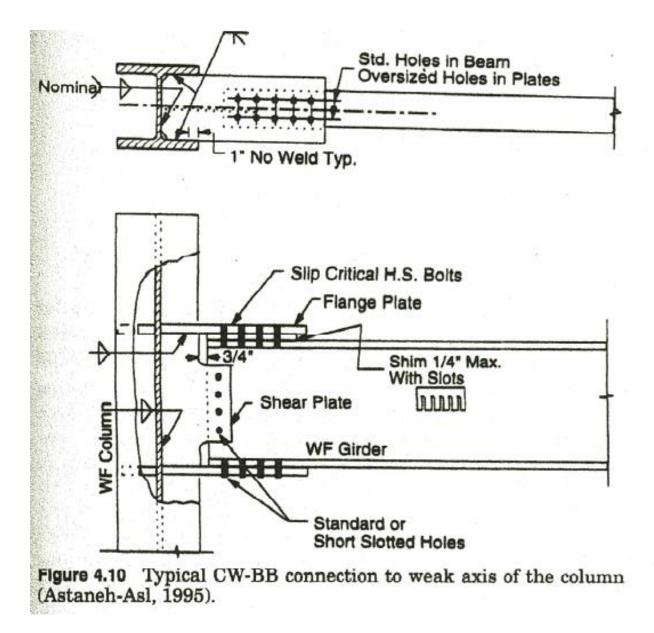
THE ASTANEH-ASL CONNECTION
